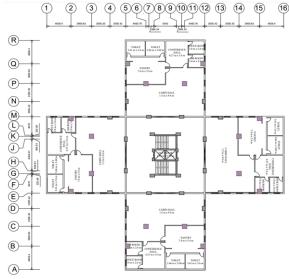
Odd level floor layout (G+3,5,7,9,11,13&15)
